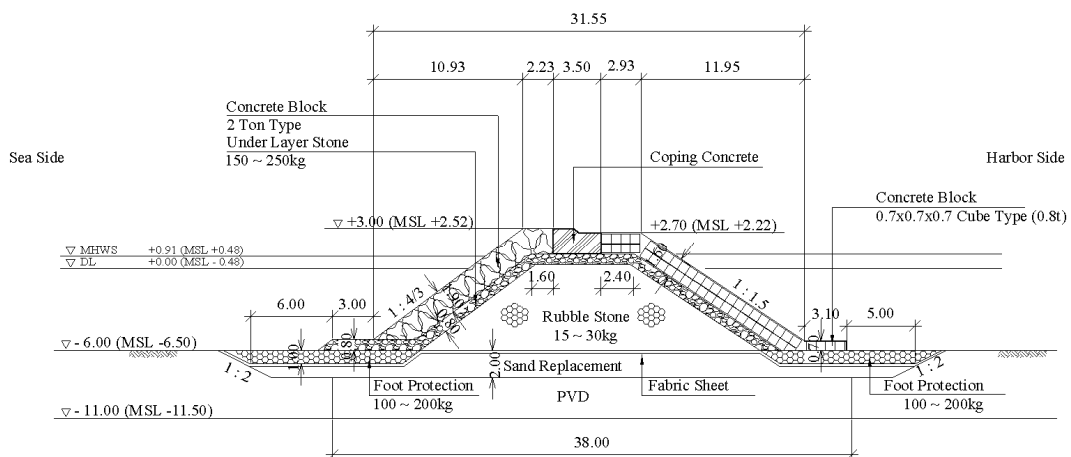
Typical Section of Breakwater in Tangerang New Terminal
